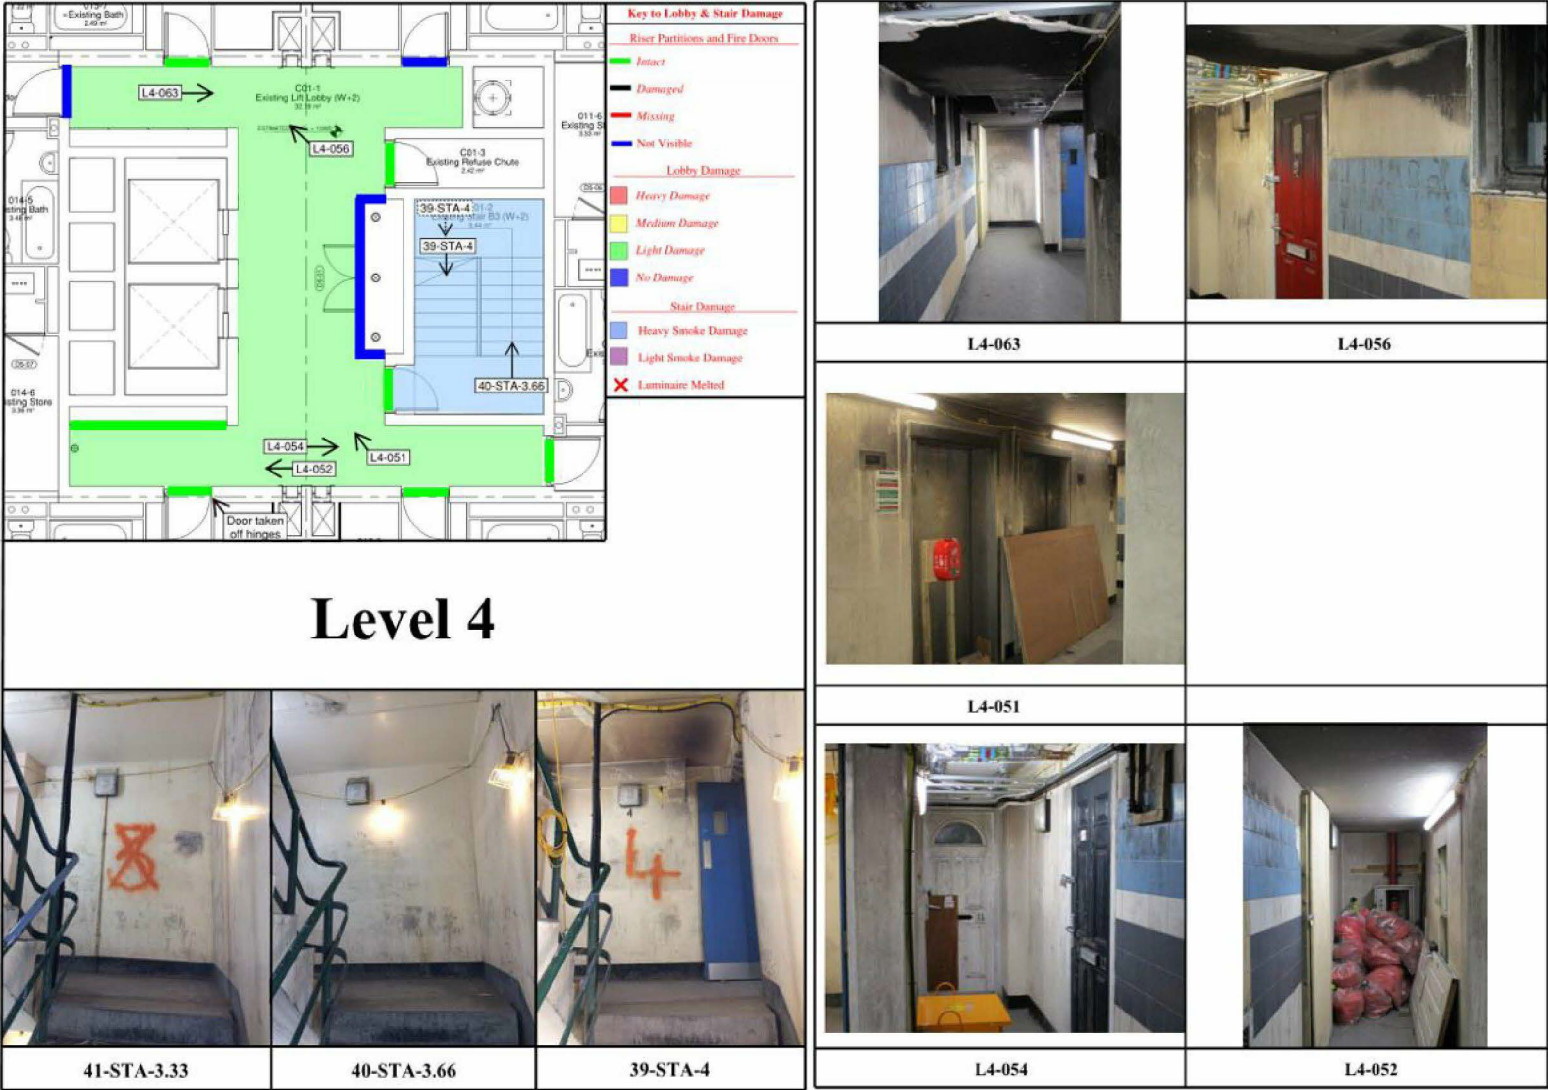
Record of stair and lobby damage from post fire site inspection – Level 04
